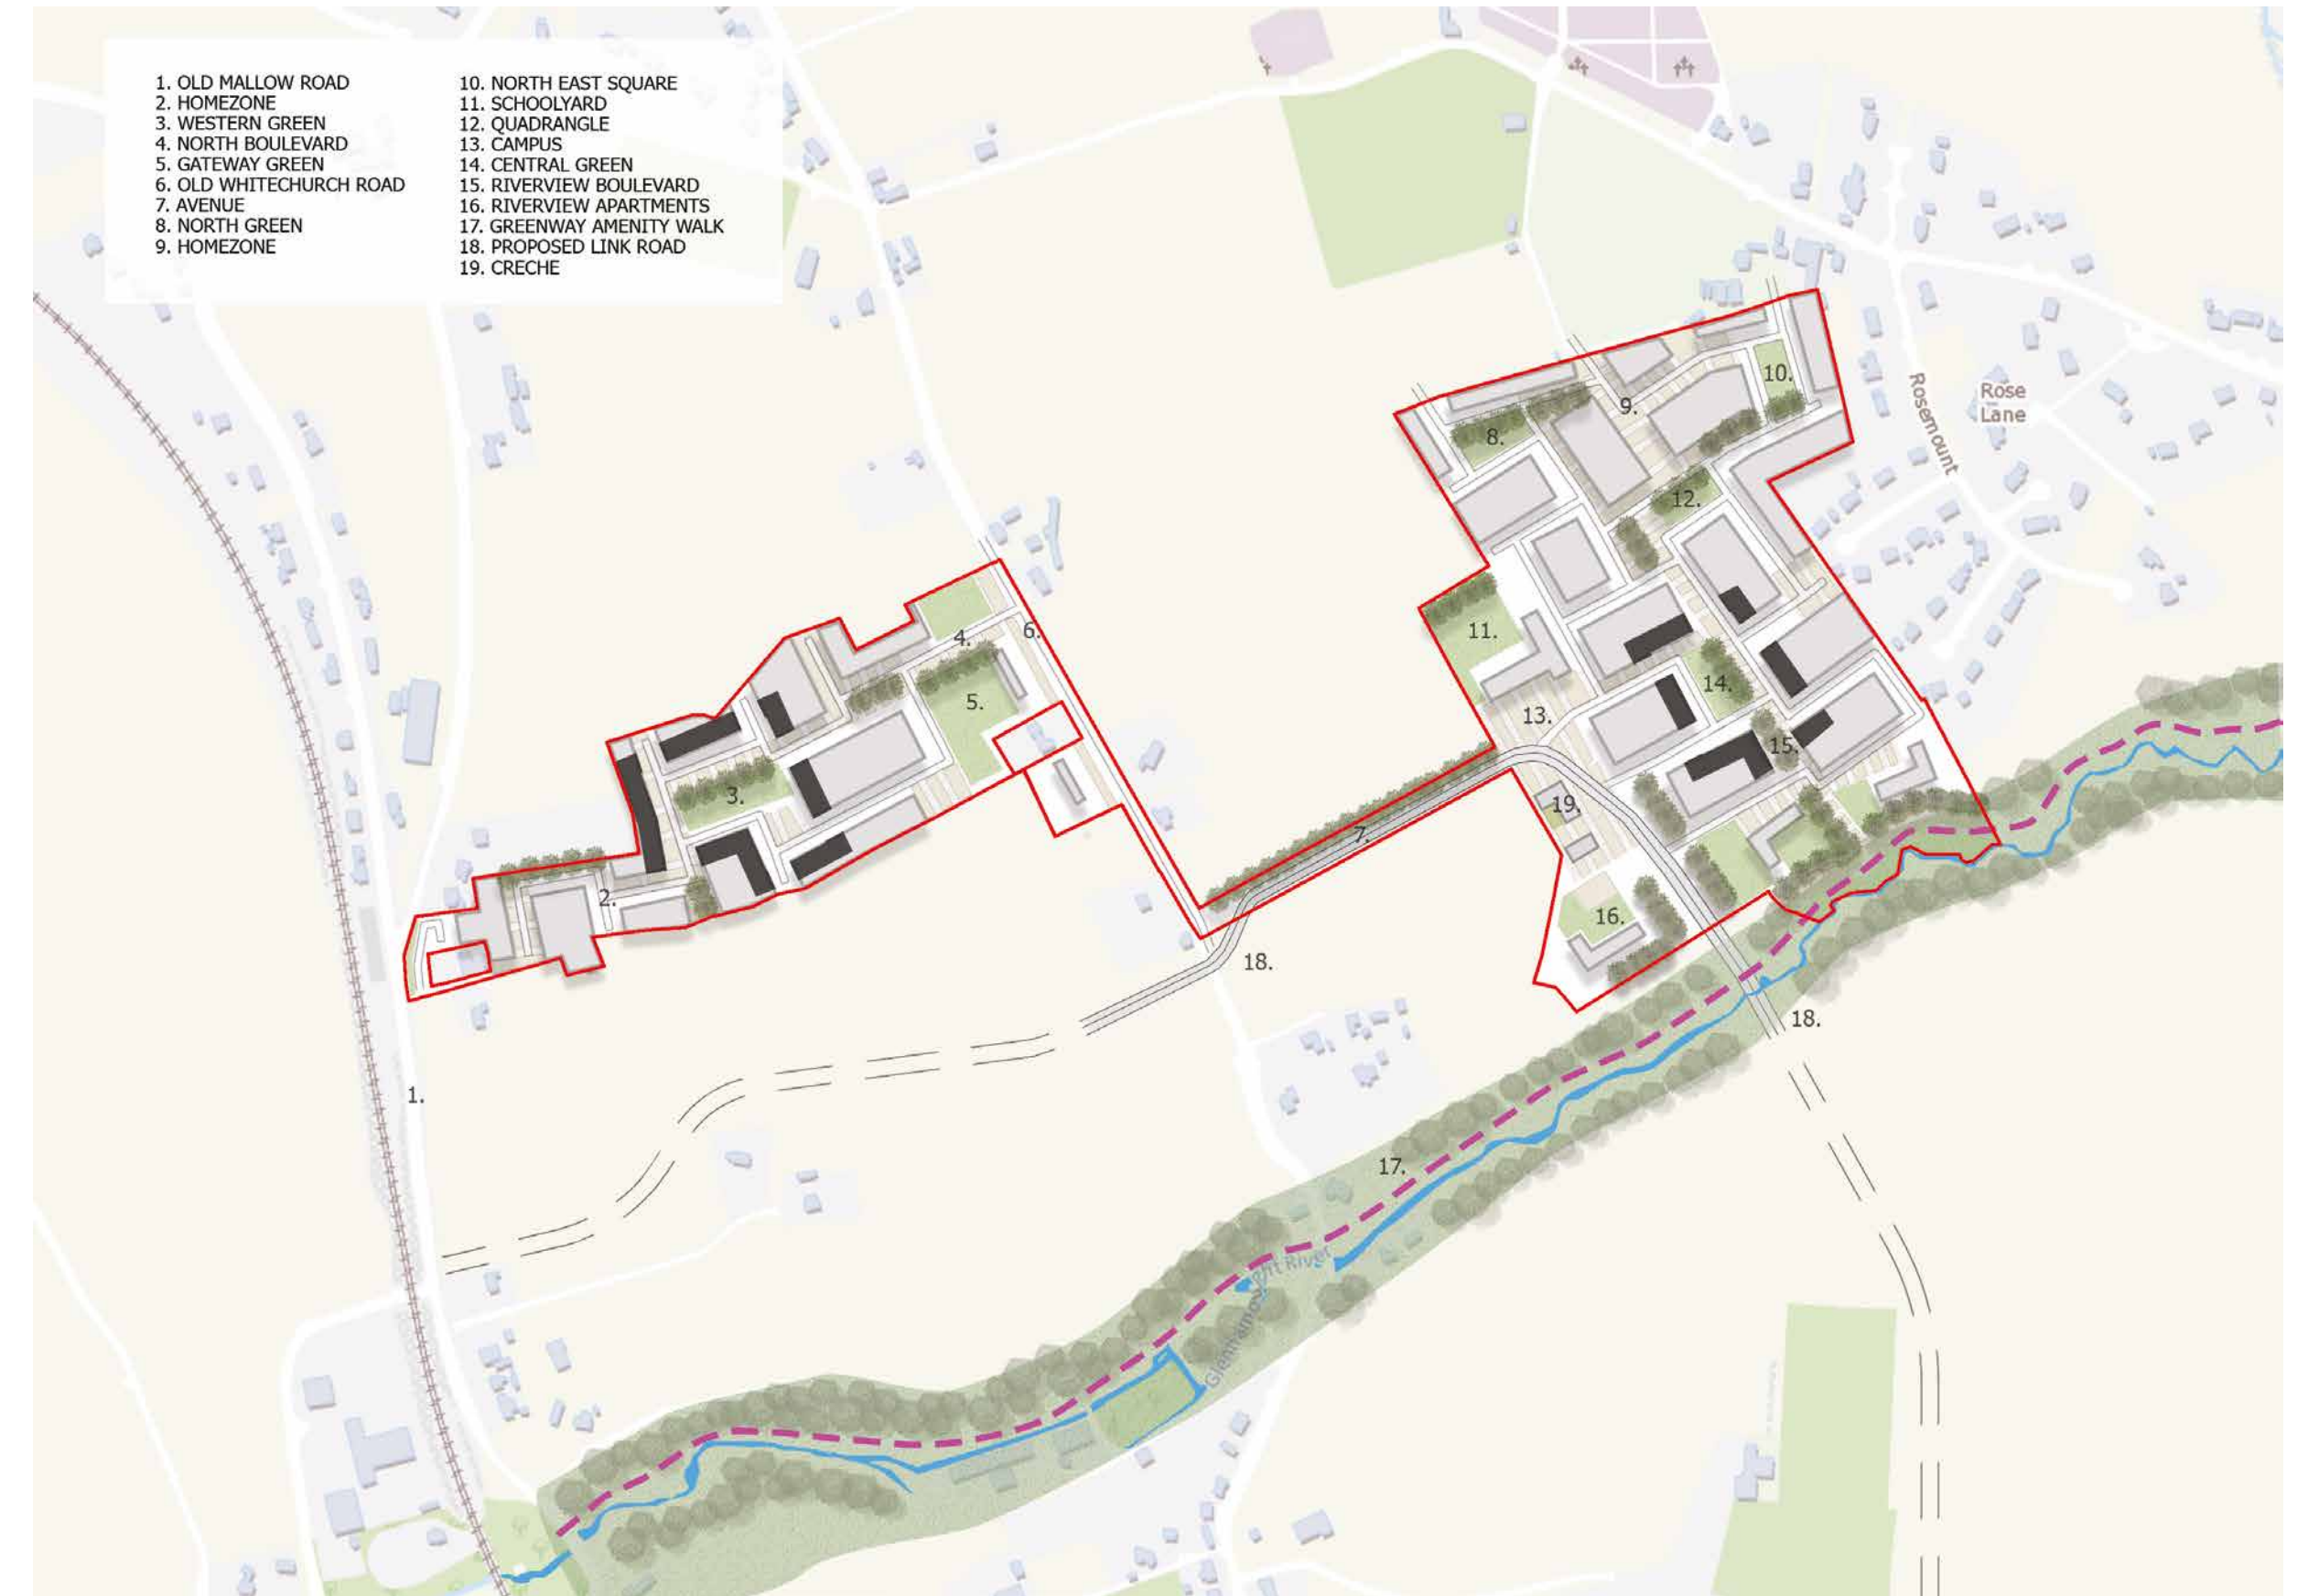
POTENTIAL DEVELOPMENT STRATEGY PLAN FOR THE KILCULLY/KILBARRY DEADY GAHAN ARCHITECTS
